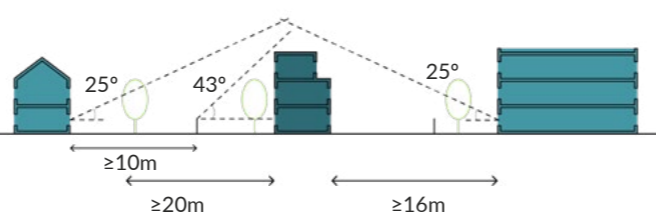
On an off-street site in an Enhance area where the flat-roofed host building is located on the right of the proposed development. A 16m separation distance between host and new building is achieved due mitigating privacy measures for upper storey windows such as obscuring openings with louvres.
